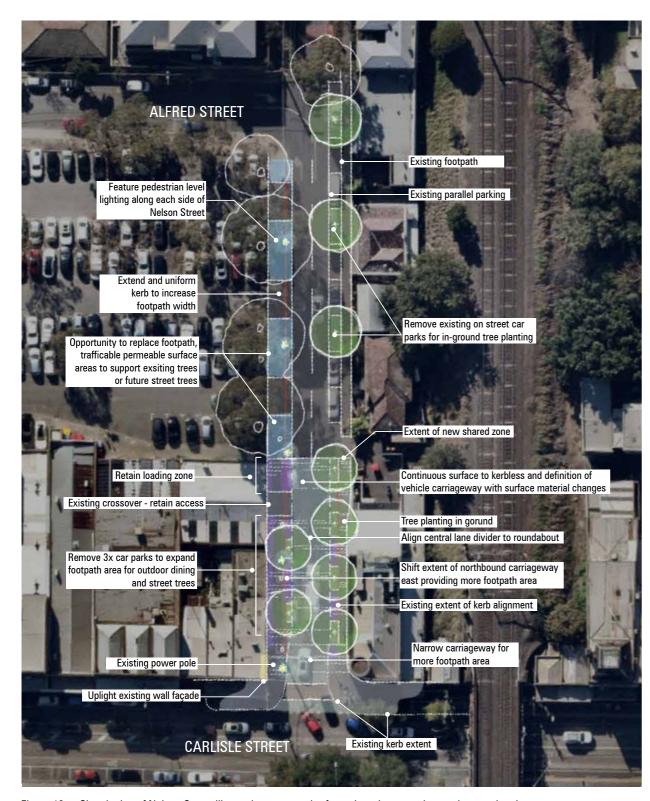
Sketch plan of Nelson Street illustrating opportunity for a shared zone at the southern end and new tree planting in tree planting, permeable area and pedestrian lighting at the northern end.
